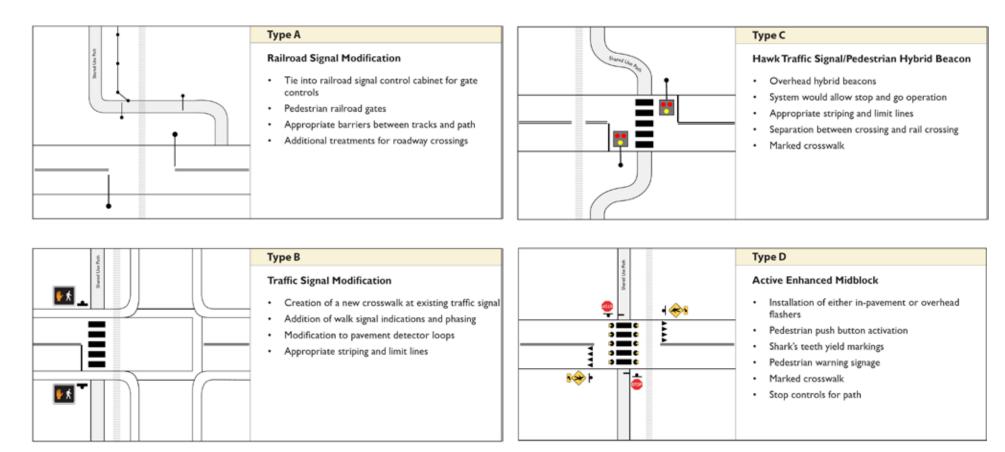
Detailed Roadway Crossing Concepts, Types A, B, C and D
